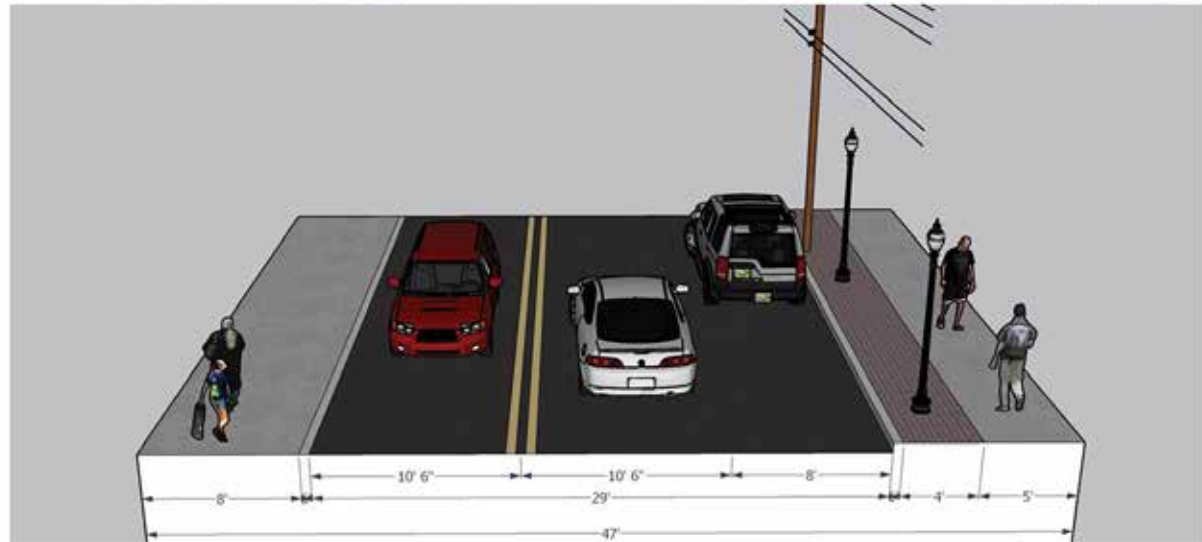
Crane Street : 3rd Ave to Main Ave Design Concept Cross-Section
